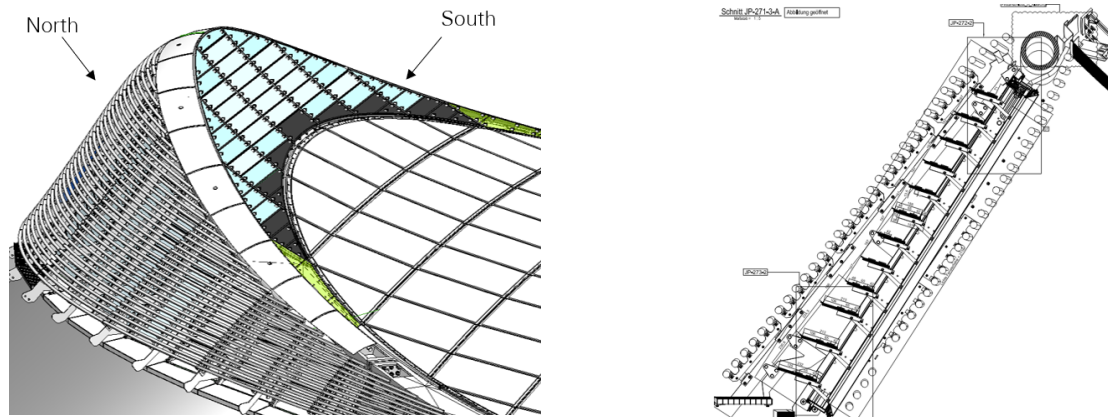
a) regular light eye with NSHEV b) section showing open north lamellas ©seele.
